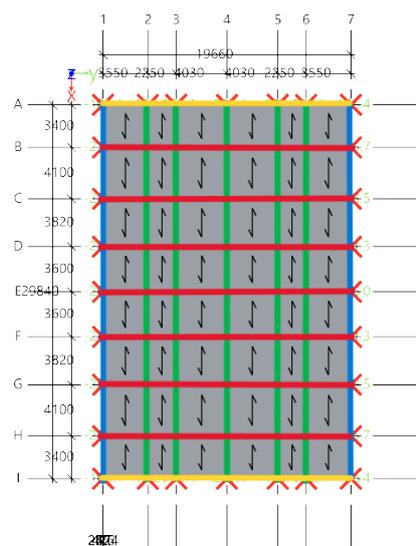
Primary internal beams (red), primary façade beams (yellow), secondary internal beams (green) and secondary façade beams (blue)
